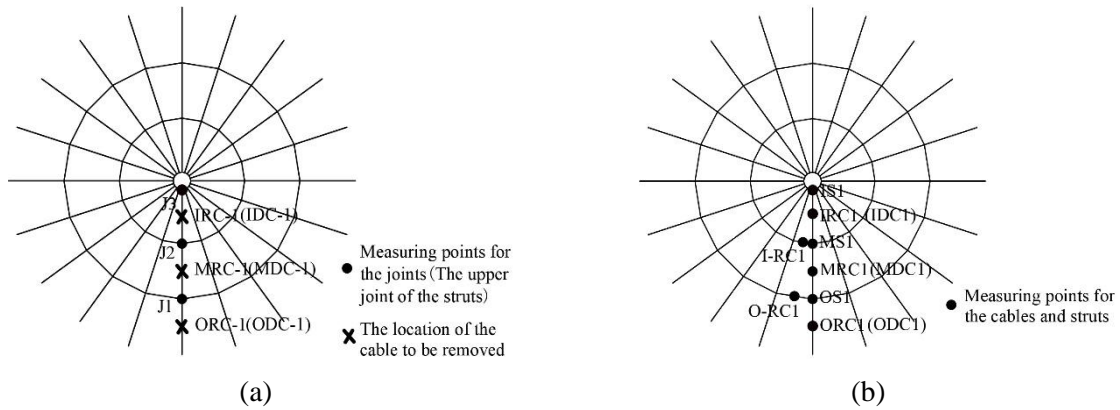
The position of cable to be removed and measuring points: (a) the members to be removed and measuring points for the joints, (b) measuring points for the members.
